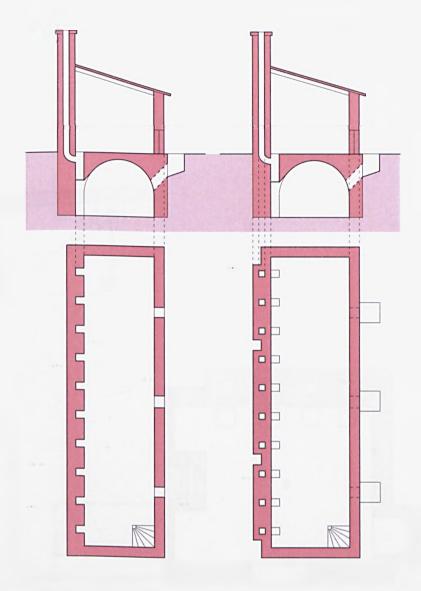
Reconstruction of Huntsman's ground floor plan (right) from information contained in the section (above) and basement plan (left). Scale 1:200 (author).
